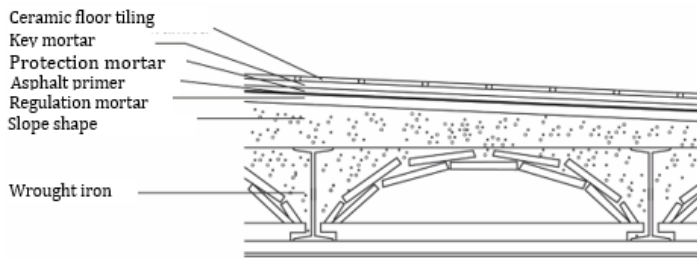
Construction detail of the roof implemented at Duclós House. Source: Preparation by the Authors.
